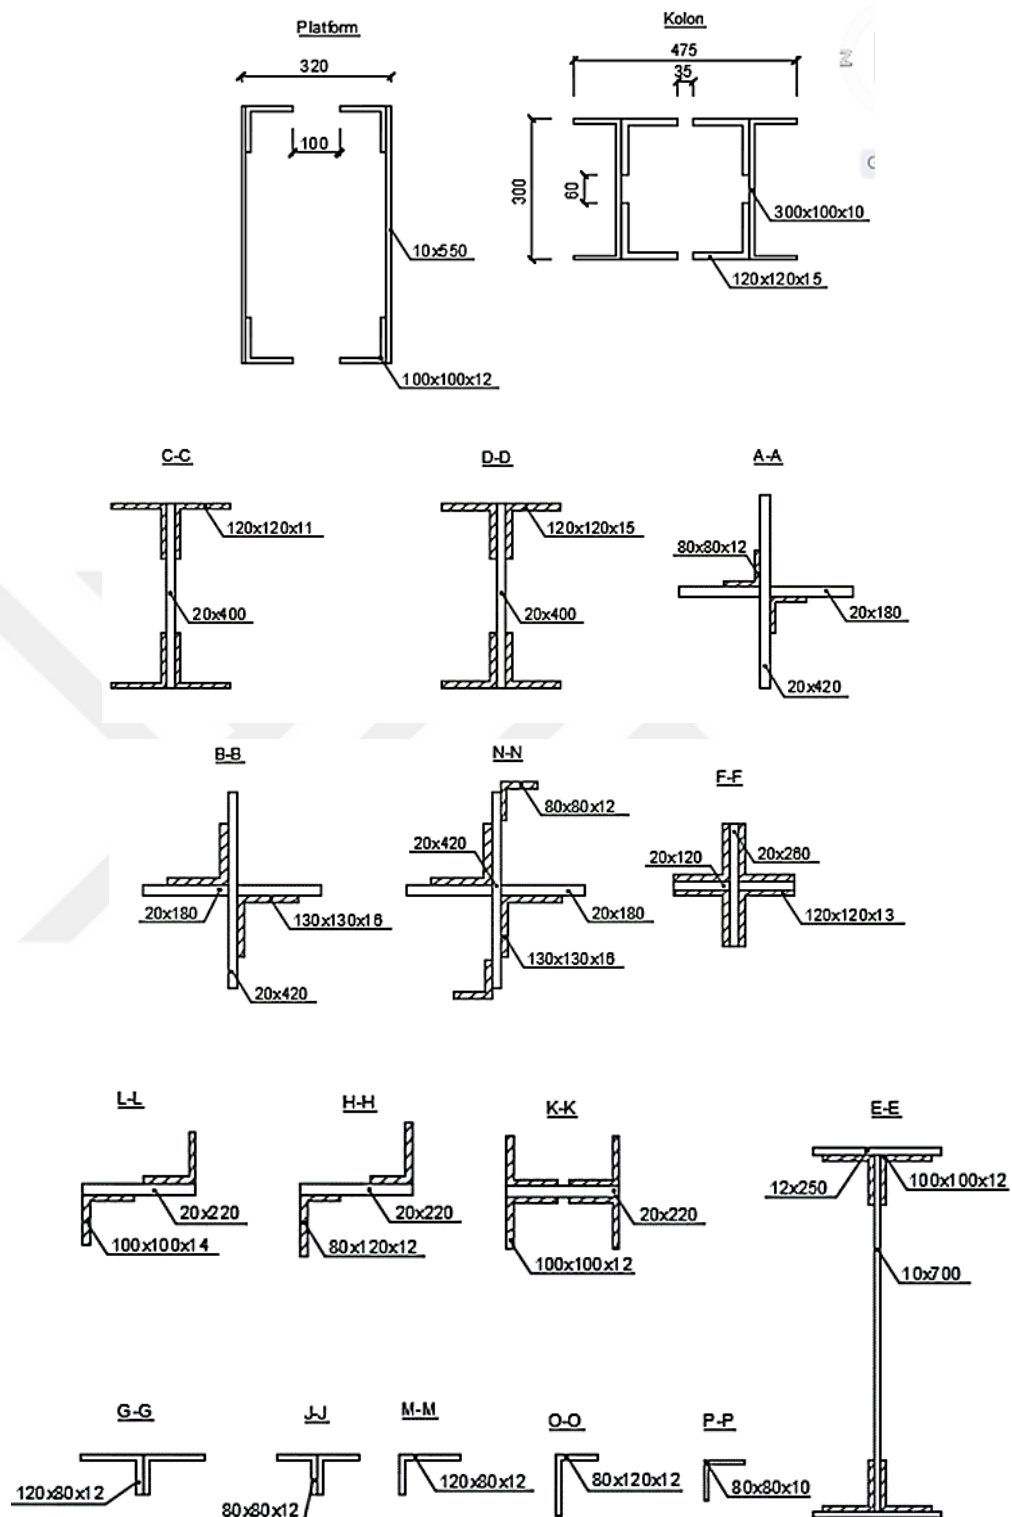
View of cross-section of 199+325 steel railroad bridge truss elements
